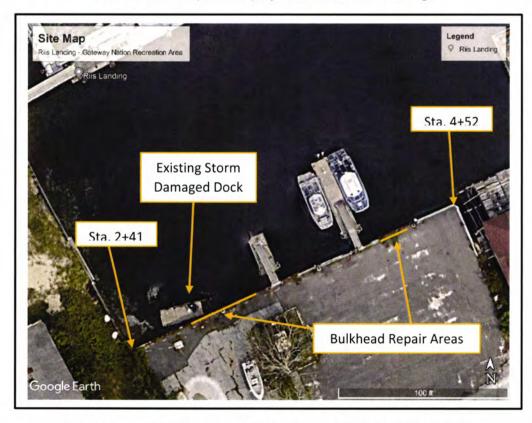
View of project site - Dock replacement and bulkhead repairs.
